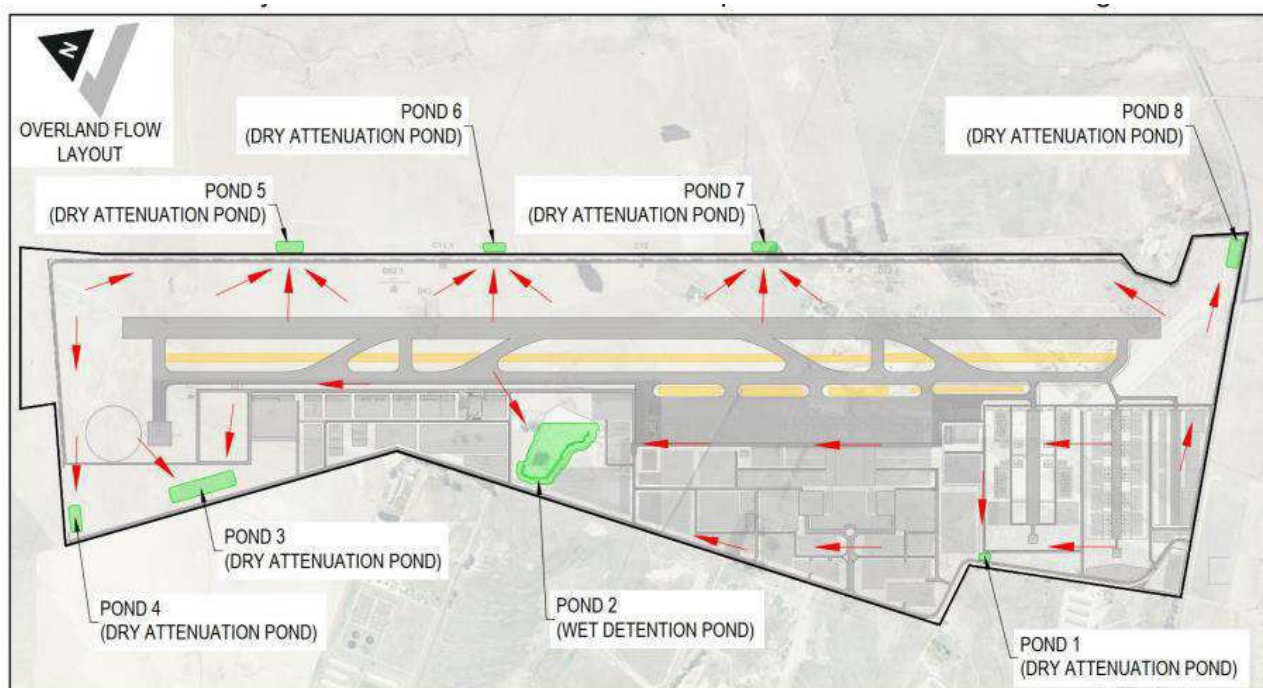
Overland Escape Routes (Zutari, Concept Stormwater Management Plan, August 2024)
